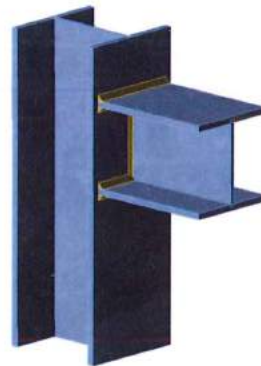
Benchmark case for welded eaves moment joint (HEB260 to HEB300)
